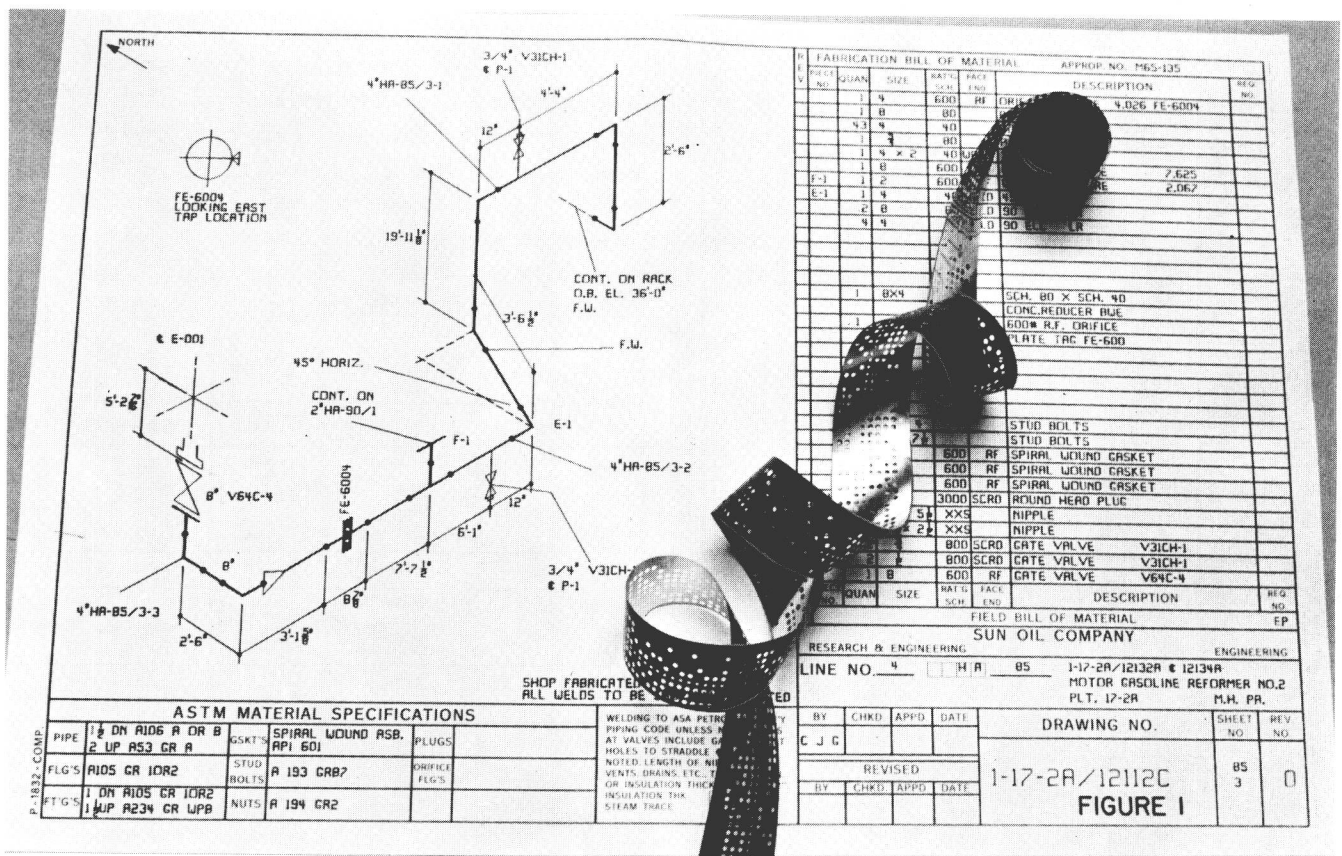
Some specialized drafting can be done by machine. The required information is "punched" into a plastic tape. The tape is fed into a computer-like machine which interprets the hole sequence in the tape and prints it on a sheet of paper. This drawing of a piping diagram in an oil refinery was made in this manner. (Sun Oil Co.)
